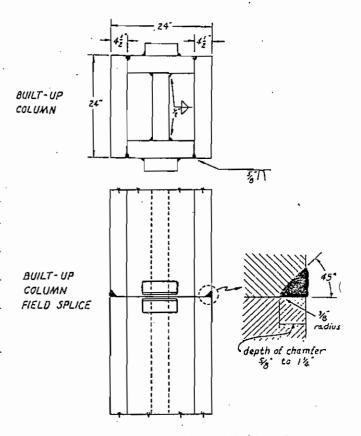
Typical column splice on Michigan Consolidated Gas Co. Building.
